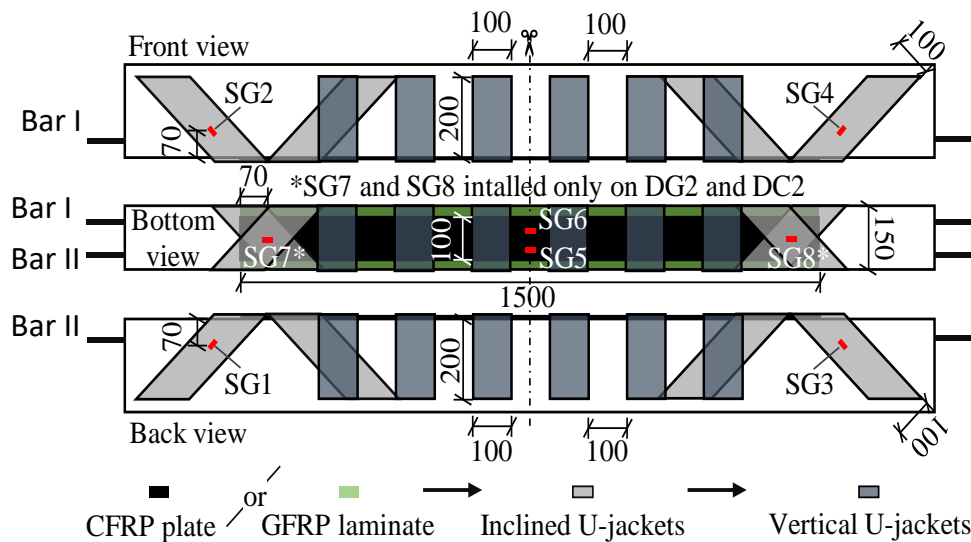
FRP strengthening method used by Yang to the corrosion damaged concrete beams [18].
